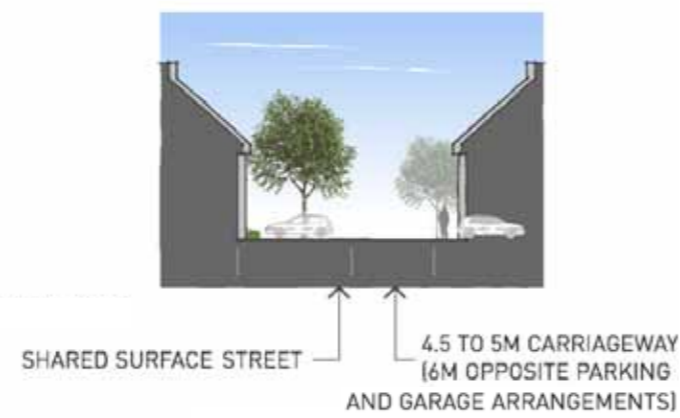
IMAGES OPPOSITE SHOW TYPICAL INDICATIVE ARRANGEMENT. FINAL STREET DESIGN TO CREATE A BALANCED DESIGN APPROACH WITH ELEMENTS CONSIDERED COMPREHENSIVELY.
